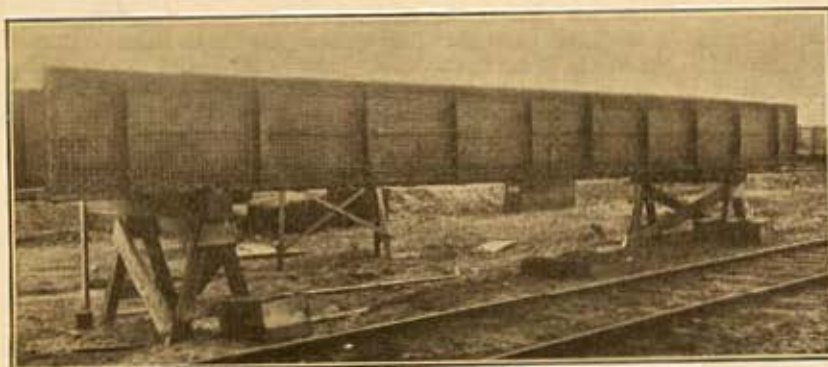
LEASIDE GIRDERS AFTER APPLICATION OF GUNITE
